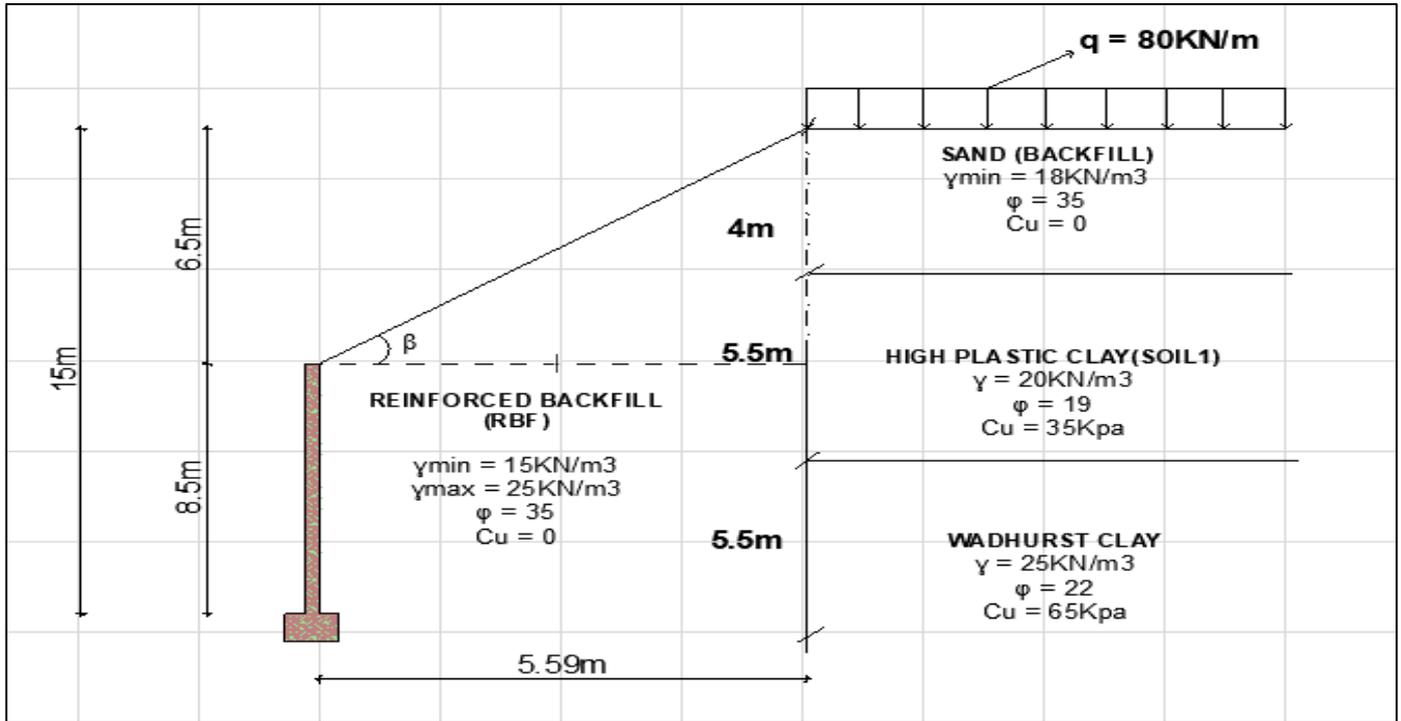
Section of the Wall to be Considered (Arch-Cad 2019)
